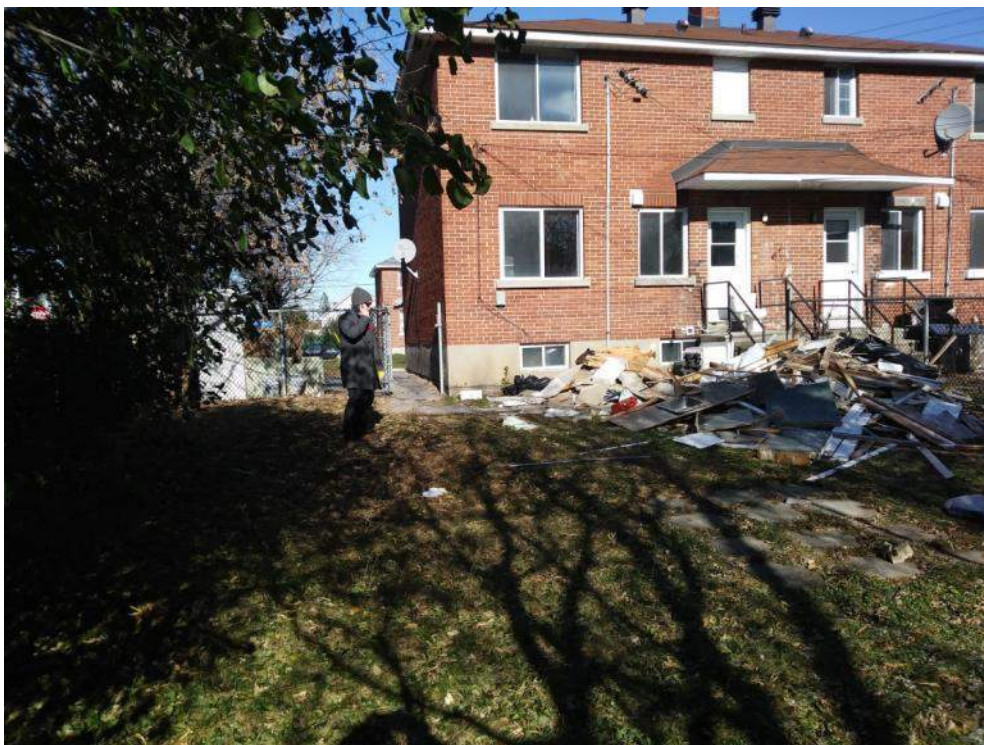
Construction debris in backyard of 208 Prince Albert Street
